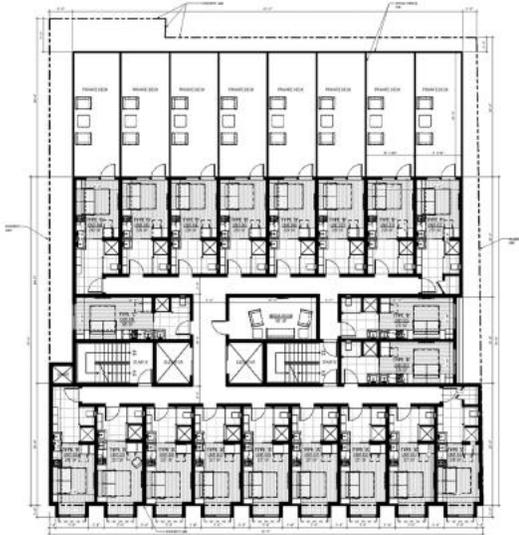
Second floor plan, Jersey City Micro-Housing proposal; the floors stack on levels 2-5 with additional side yard setbacks on the 6th floor.
